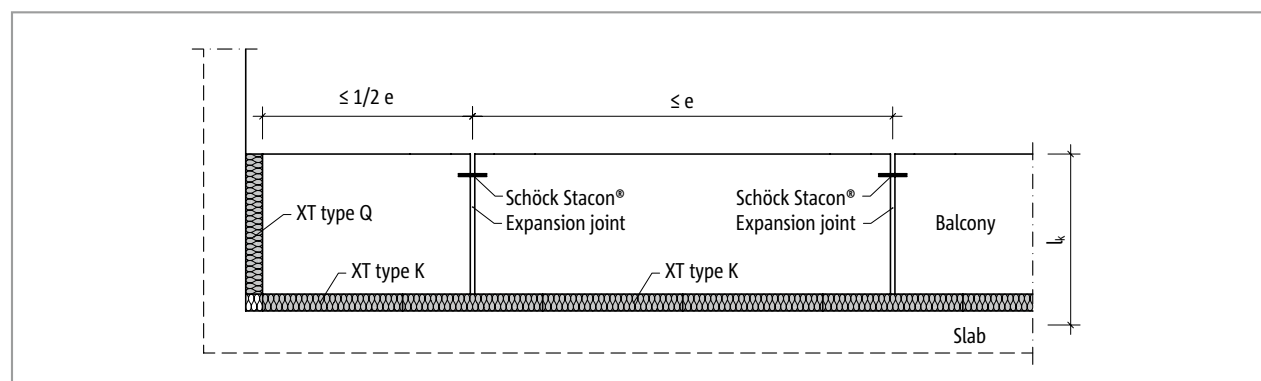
Schöck Isokorb® XT type K: Expansion joint arrangement
